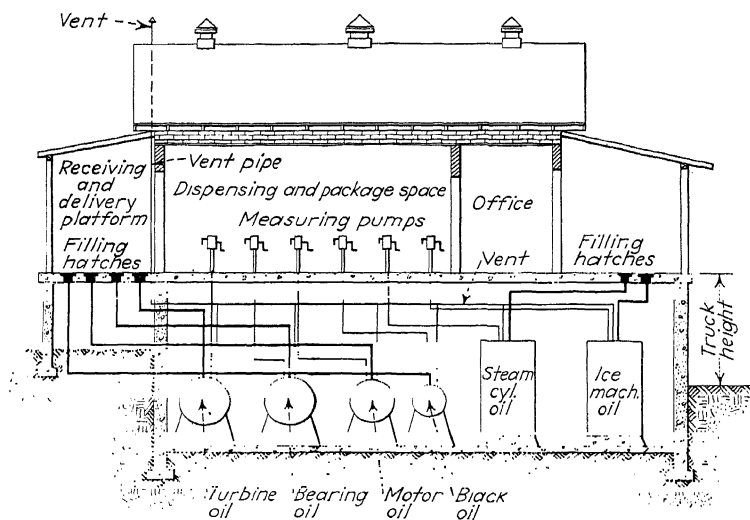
Sectional elevation of a central oil-storage house, showing location of tanks, pumps, filling hatches, and other equipment.
